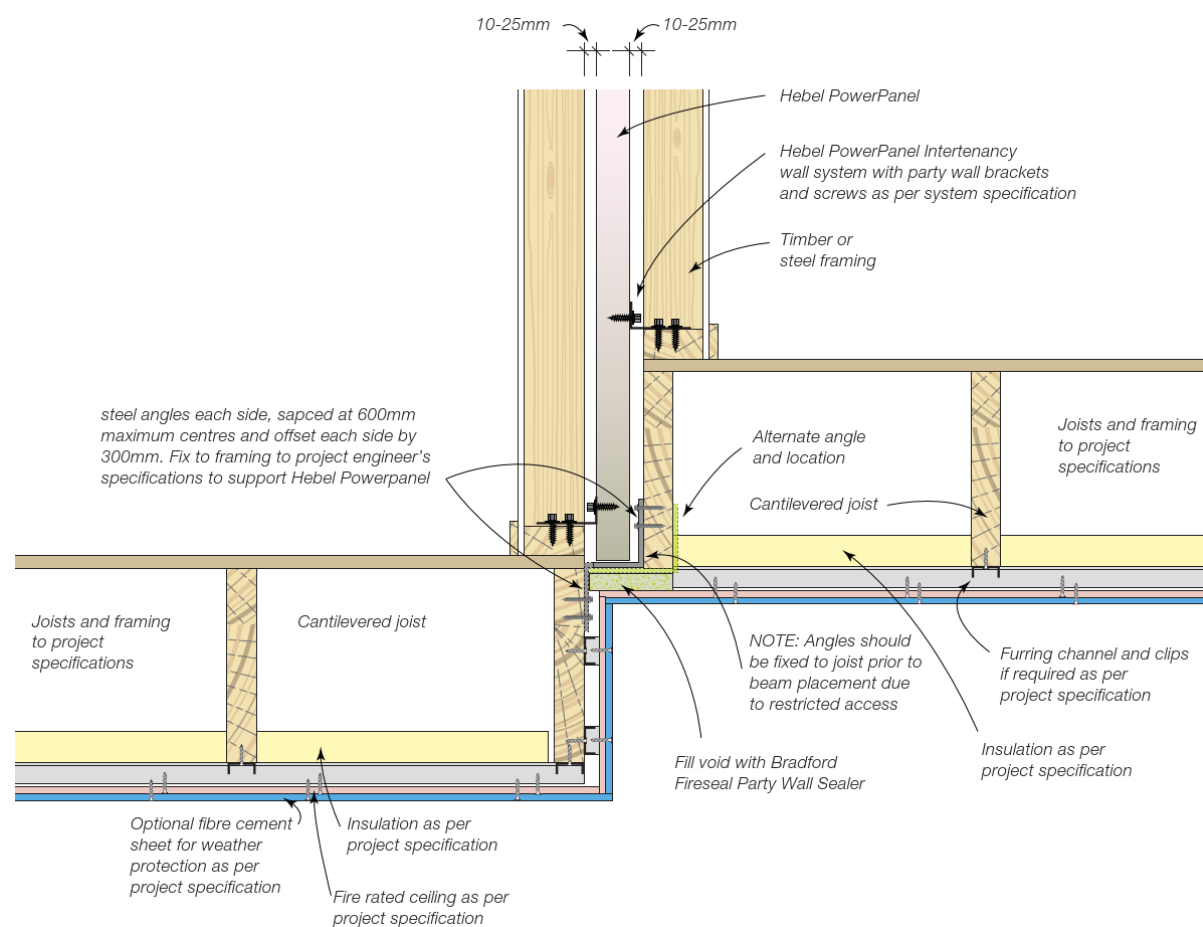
Cantilevered intertenancy system supported with steel angles – stepped soffit
